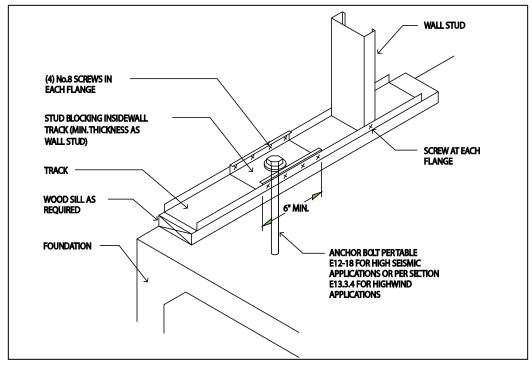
Braced Wall to Foundation Connection With Wood Sill
